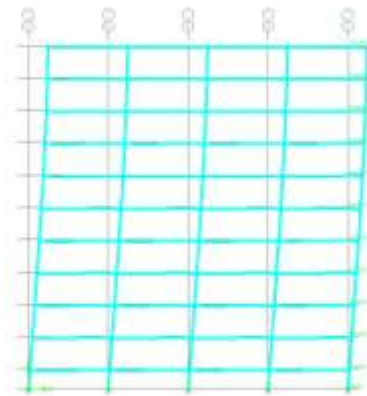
Model 2: G+10 RC bare frame building with slab element lateral displacement
